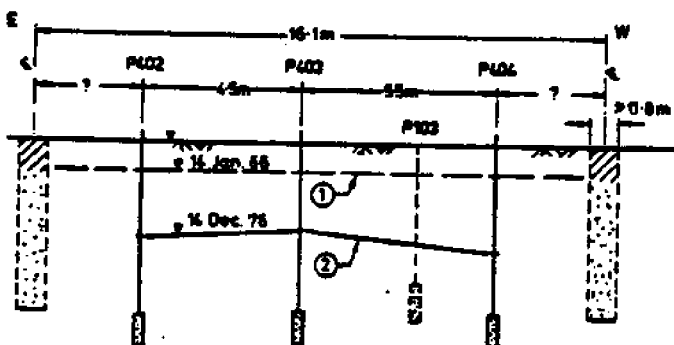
Cross-section of trench drain installation at Guildford Surrey, showing the long-term effect of drainage (largely after Simons, 1977). (1) Approximate piezometric level before drainings, based on piezometer P103. (2) Position of the piezometric surface about 10.5 years after installation of the drains.
